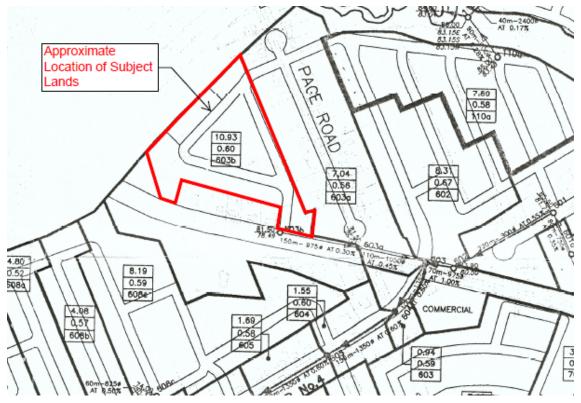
Location of Subject Lands on Stantec EUC Storm Drainage Area Plan
